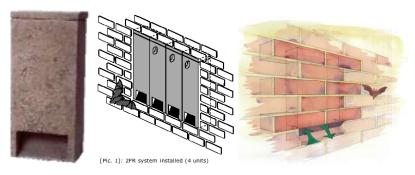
Bat tubes incorporated into the wall of a building to provide roosting space.
